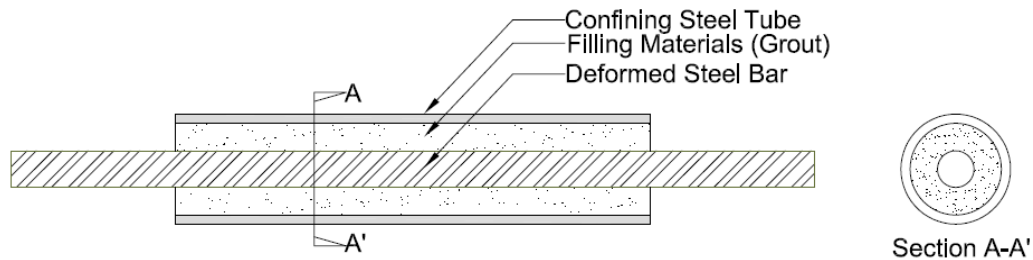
Geometric configuration of Buckling Restrained Reinforcement
